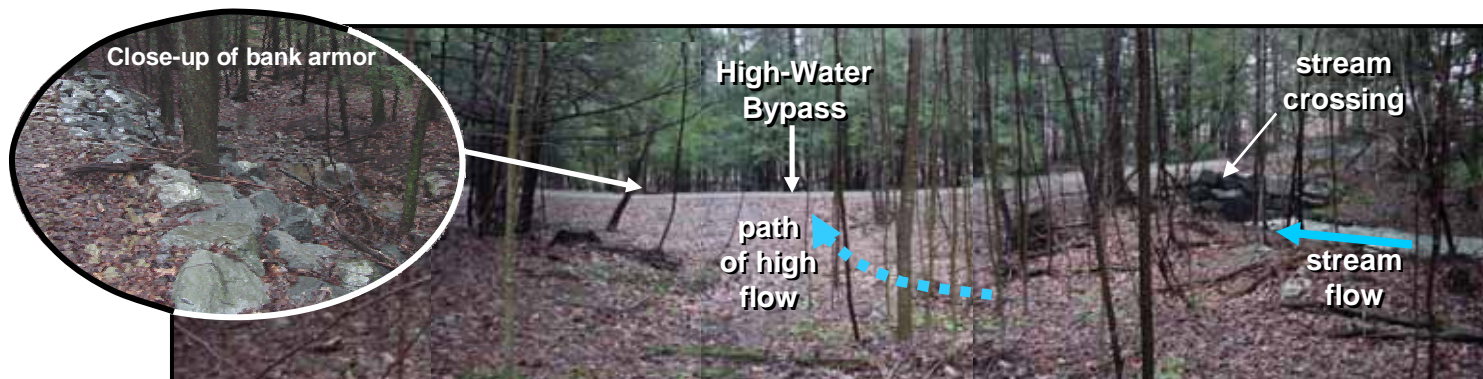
Geo-synthetic and rock reinforcement was used on the bypass due to width limitations and a steep drop-off on the downslope side of the road. When stream flow exceeds pipe capacity at the crossing, water will flow over the bypass.
